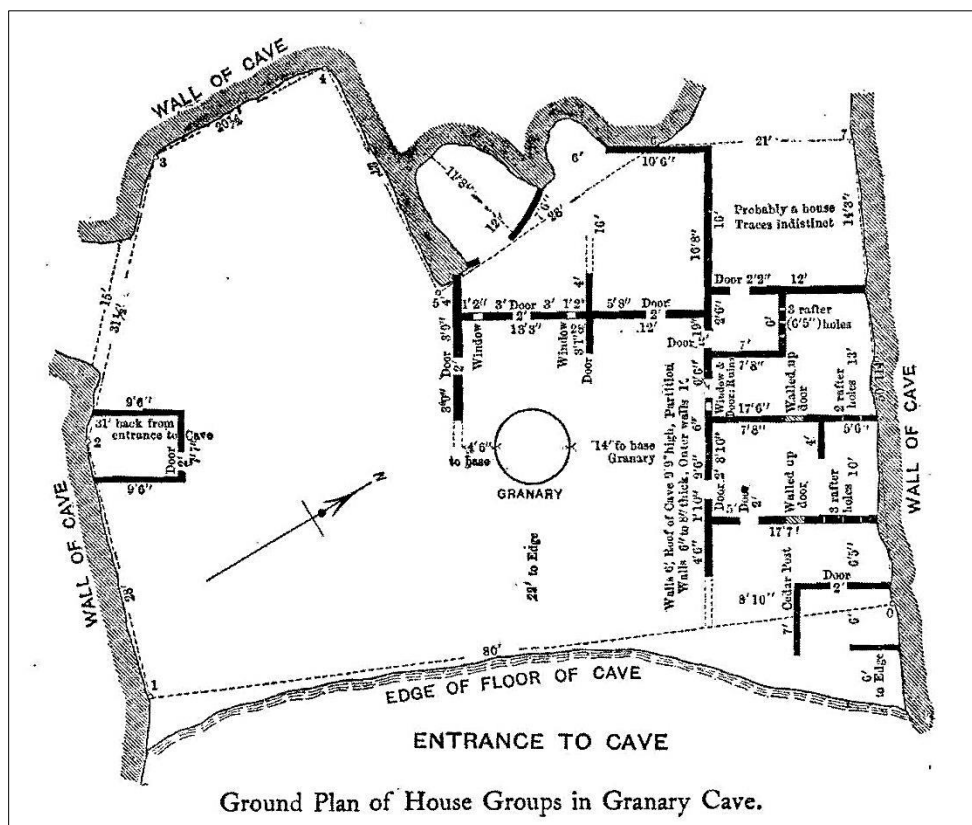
Ground Plan of House Groups in Cave (Lumholtz 1902: 62)
